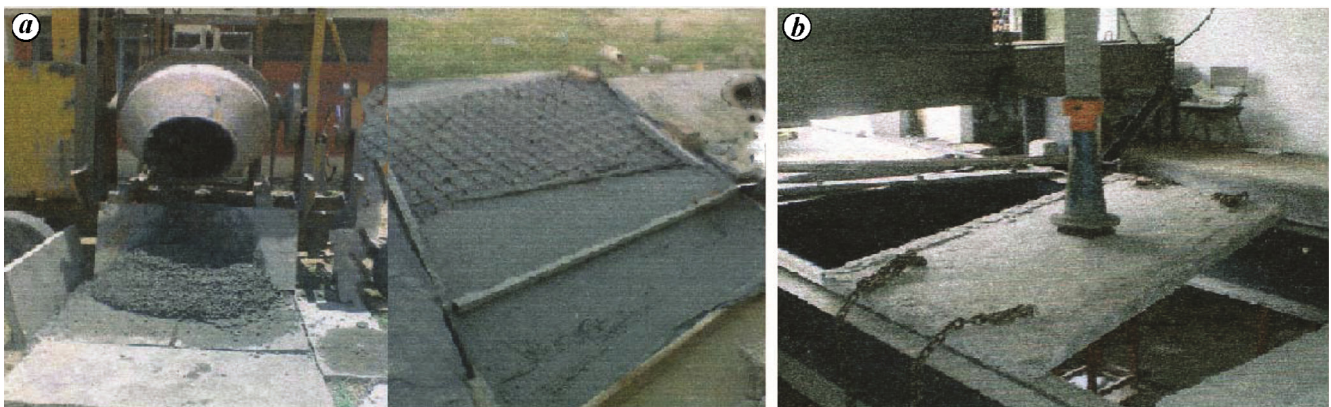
Operation of casting and testing of skew slab specimens: (a) casting and (b) testing.
